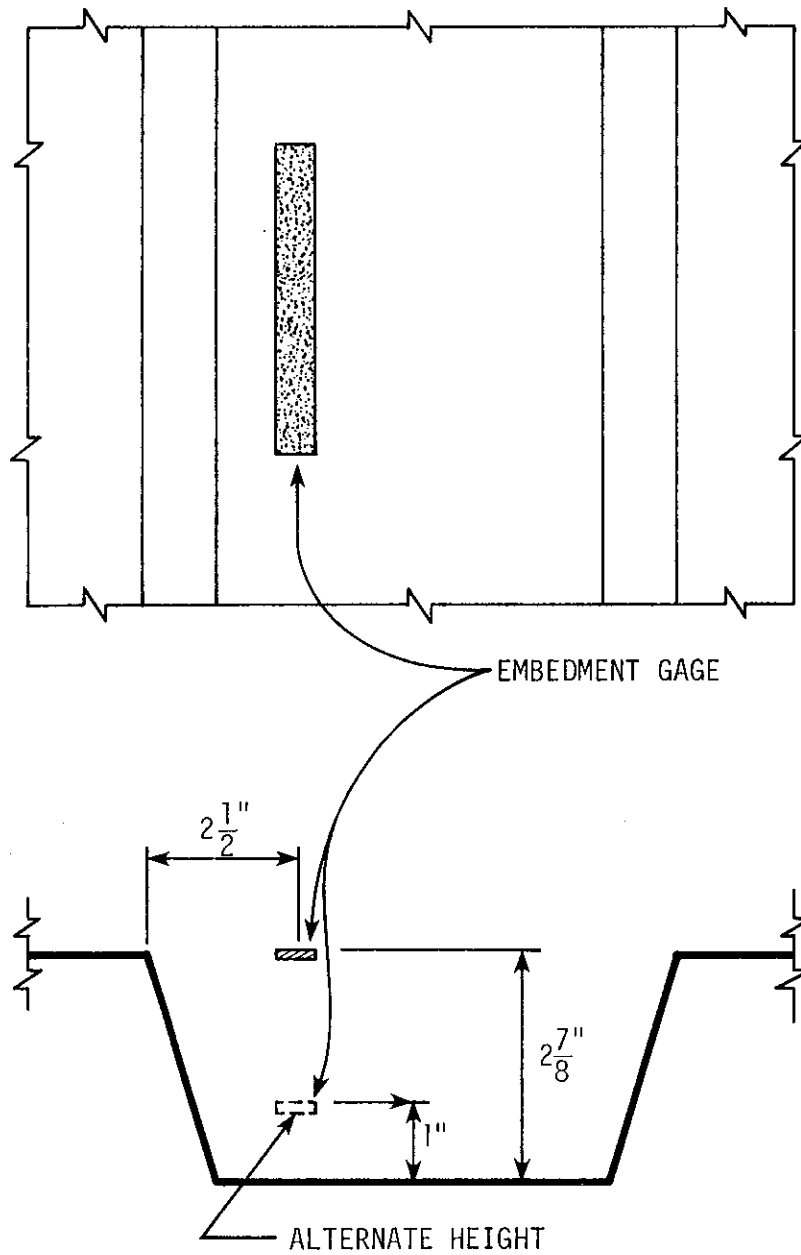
Typical placement of embedment gages relative to deck cross section.
